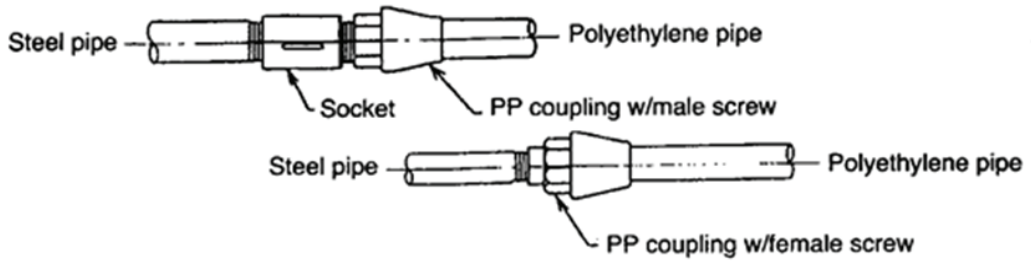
Connecting Steel Pipe to PE Pipe by (1) PE male coupling, (2) PE female coupling
